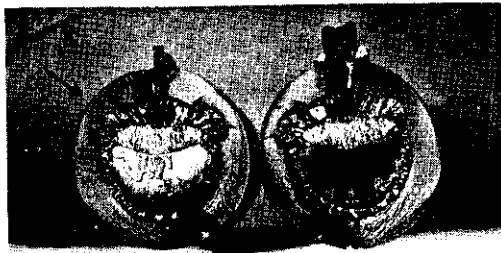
Fracture surface of Cad Weld splice (CW303)
